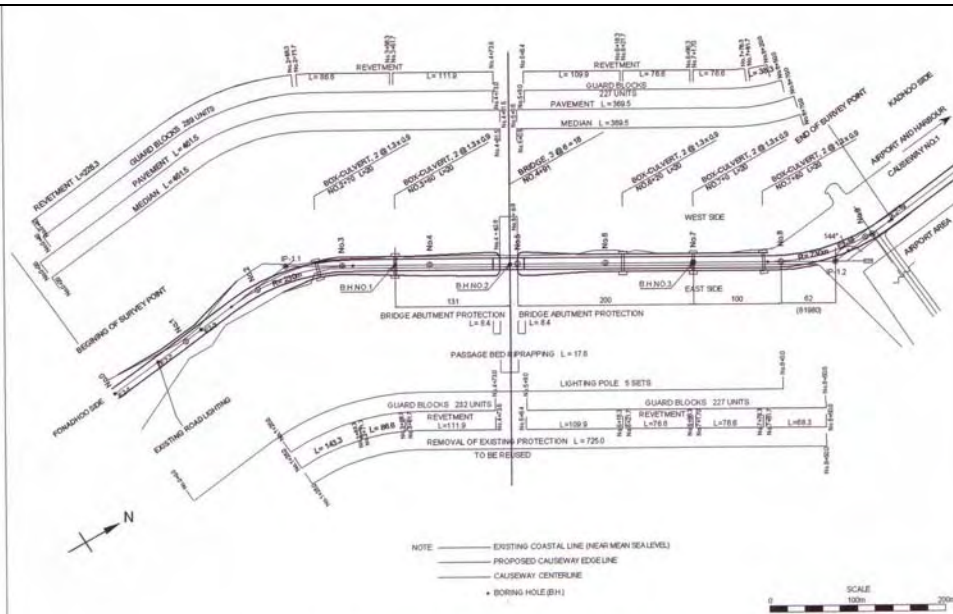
General Plan of Causeway No.2 (Fonadhoo-Kadhoo)
